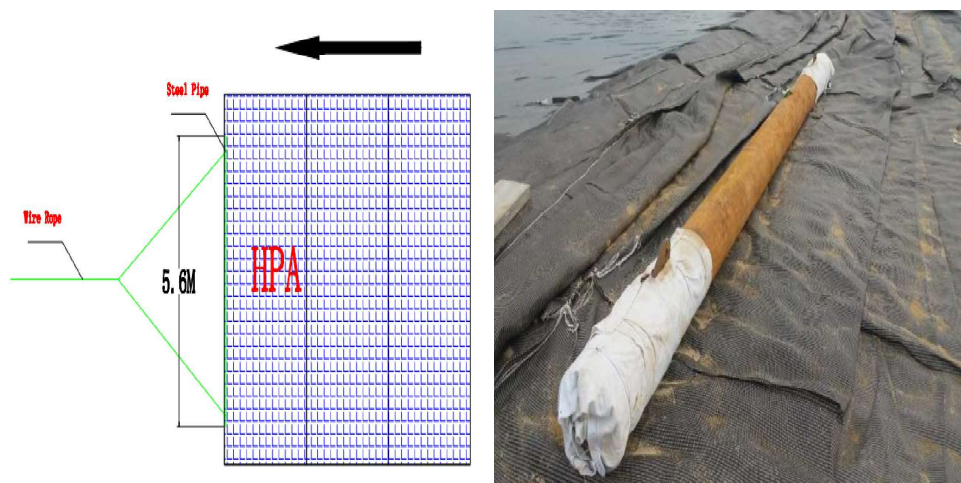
Steel pipes installation used to reduce the pulling stress acting on the geotextiles
